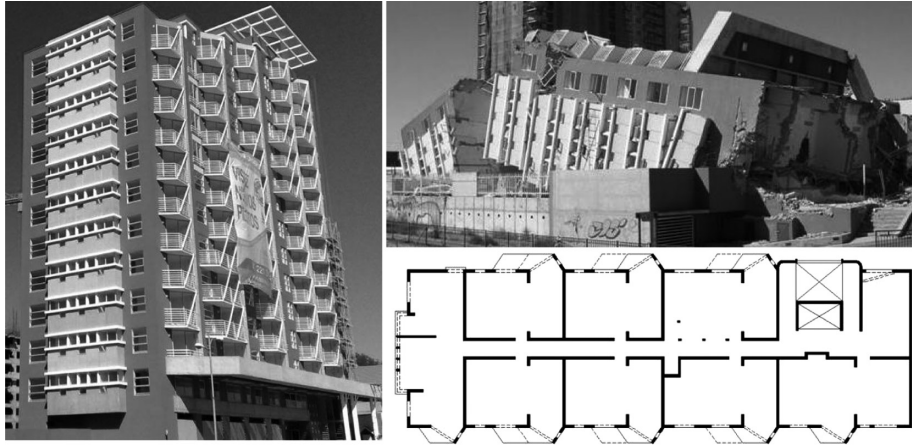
Collapse of Alto Rio wall building in Concepción, Chile; February 2010 earthquake (structural walls are shown in black in the framing plan).
